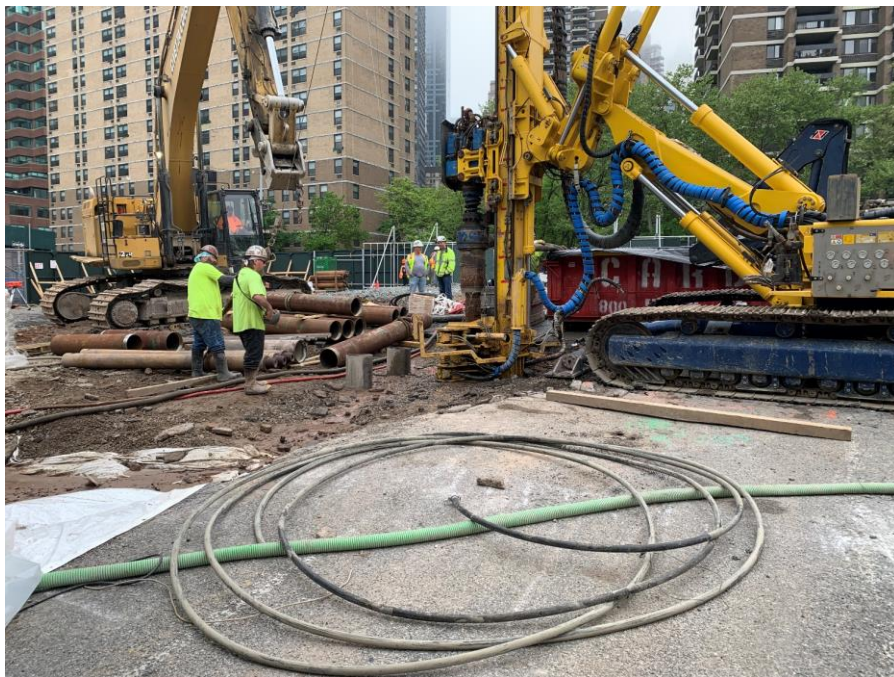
View of CCJV advancing a foundation pile in the southwestern portion of the site (facing northwest).
